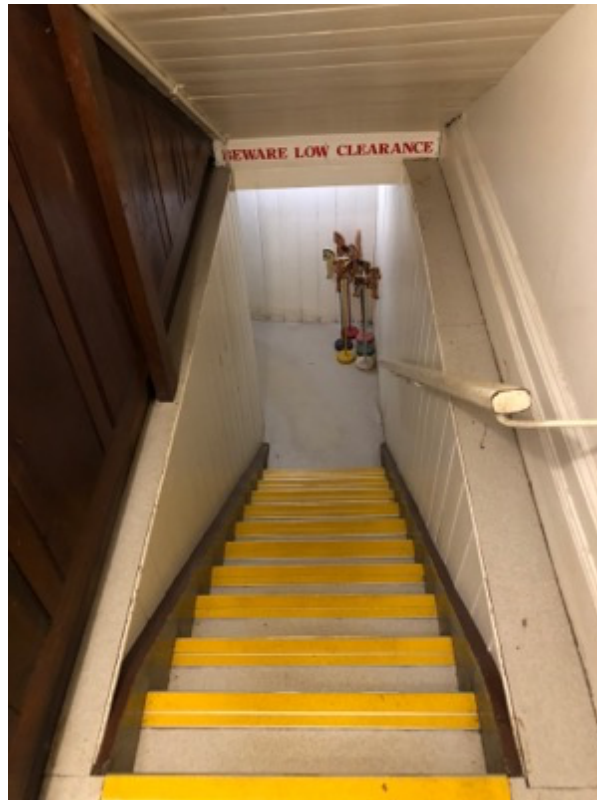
Stair between the ground floor and the basement. The stair provides the only interior access between the ground and basement levels. The original treads have been replaced within the existing treads.
